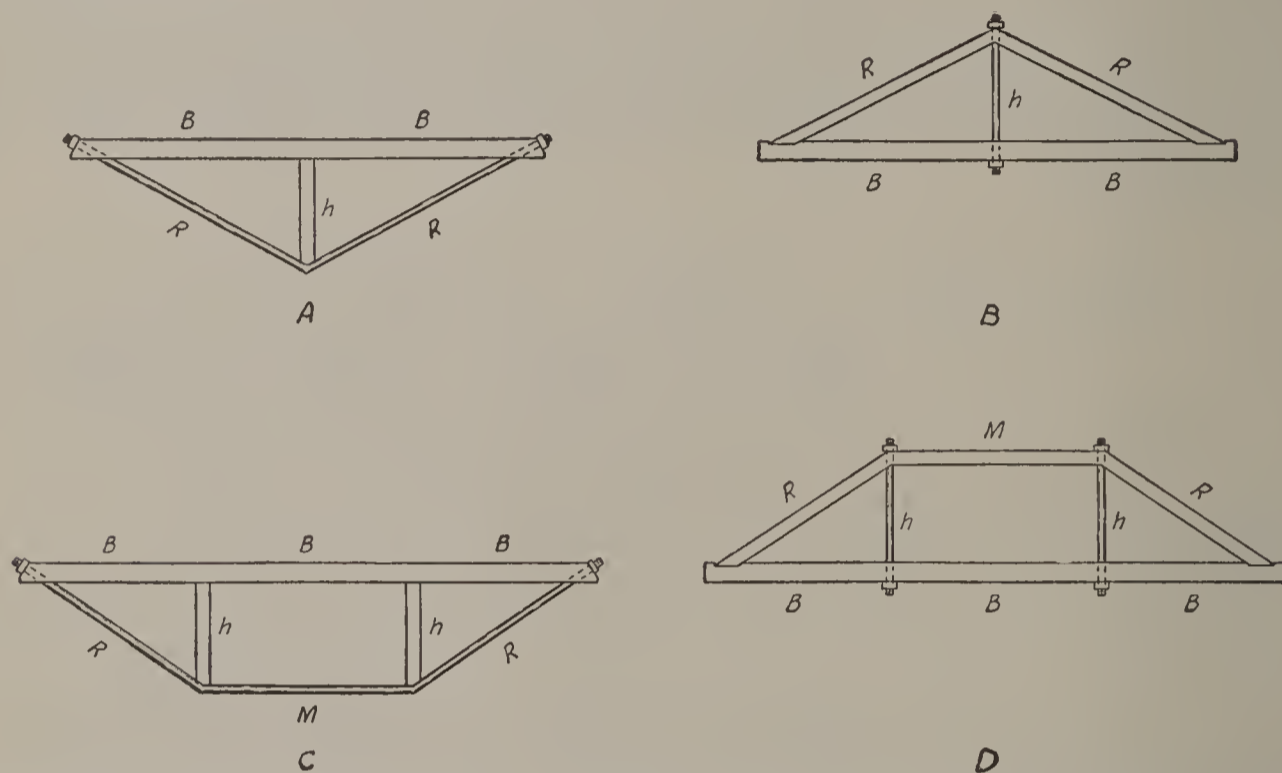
A* and *B*, King types of trussed beams; *C* and *D*, queen types of trussed beams.
